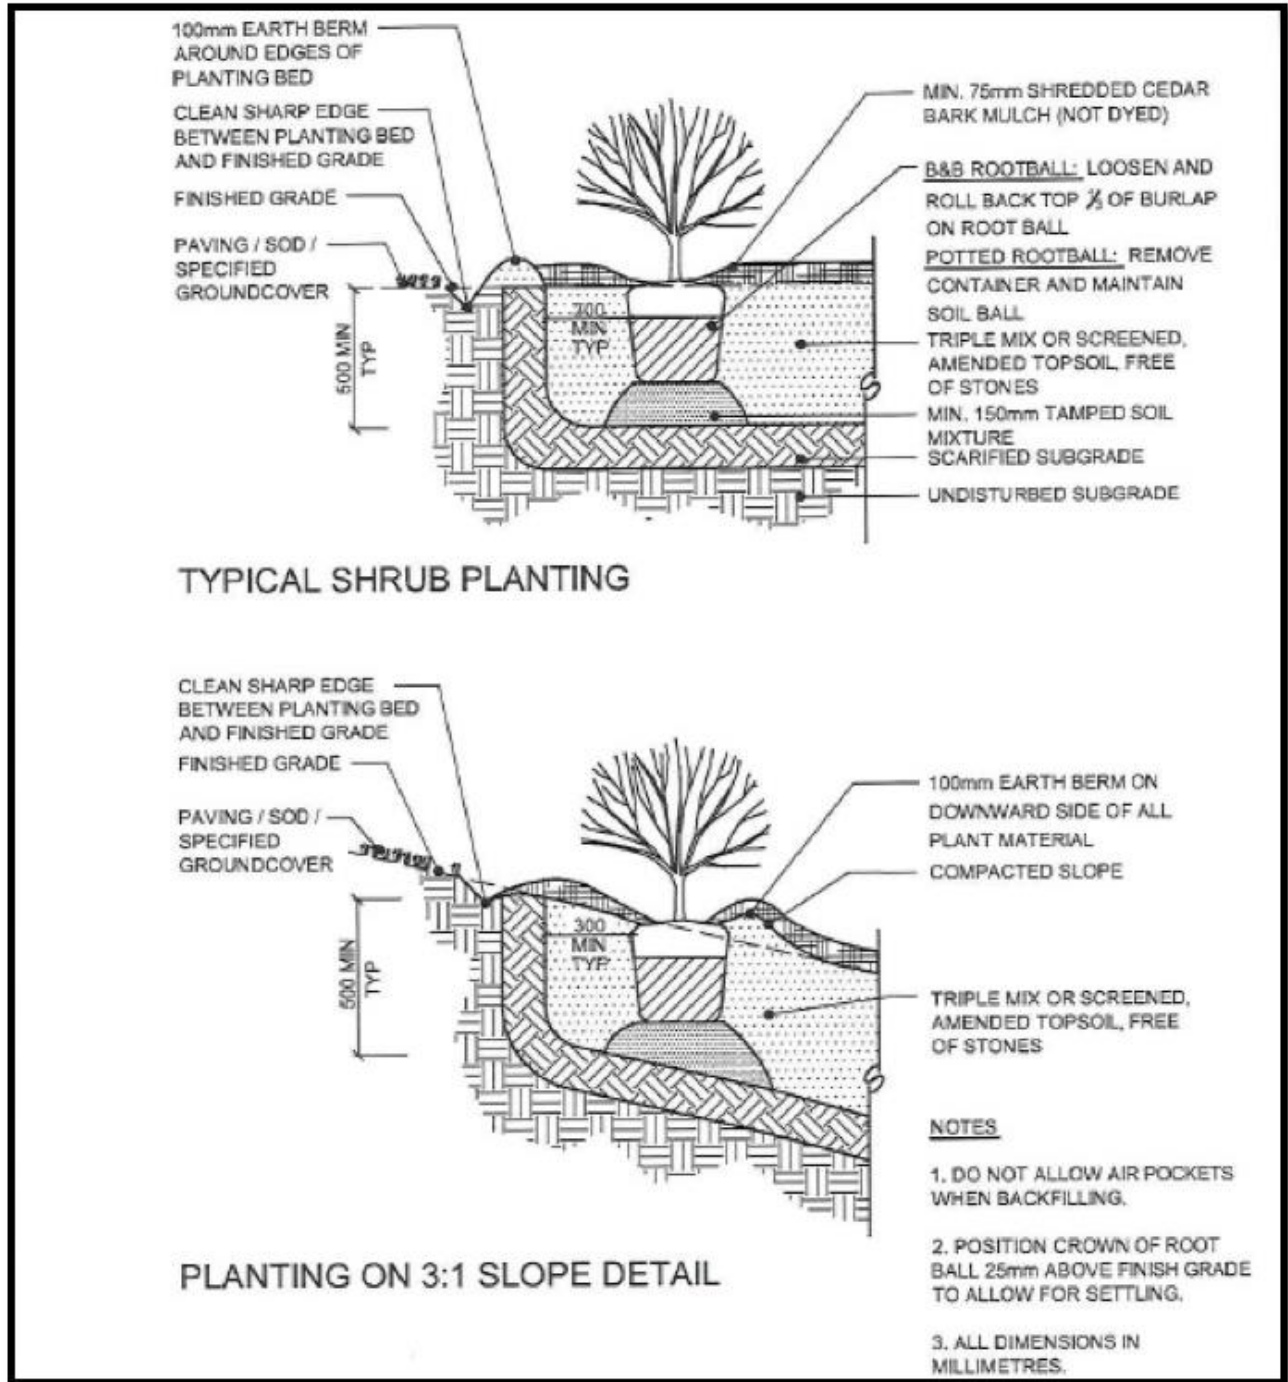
Town of Collingwood tree planting methodology for shrubs
